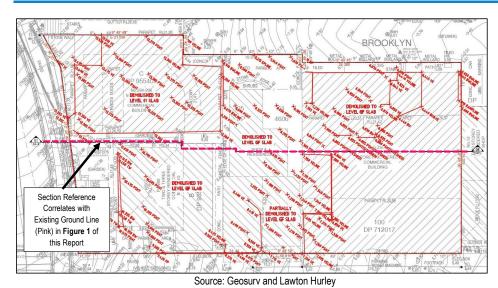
Excerpt of Survey Plan (7/3/23) With Reference for Section Looking West
